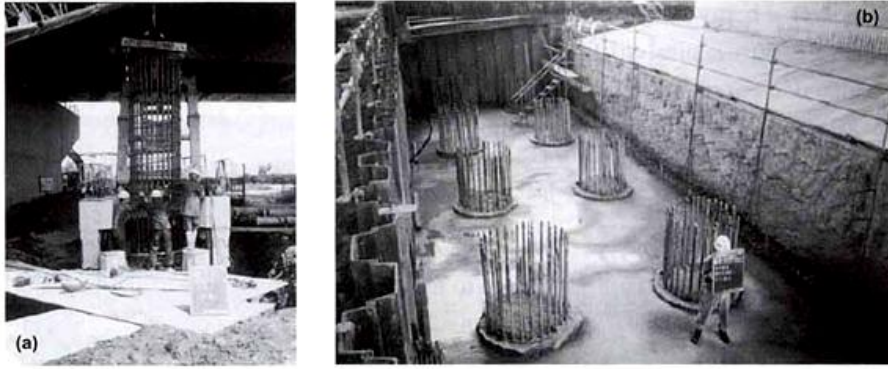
(a) Space limitations when installing new piles underneath a bridge deck : requires special “mini” cranes and short reinforcement cages, (b) addition of new piles in the perimeter of the pile cap : requires the closure of the ground highway
